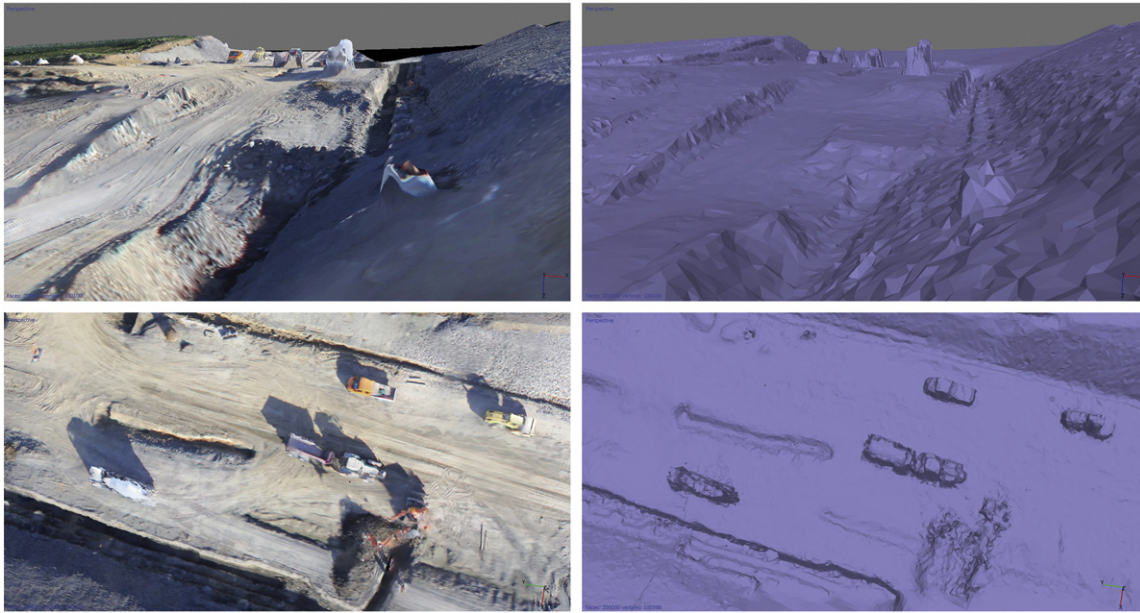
Next steps in research: automated analysis of excavation parameters (slope and safety requirements) and construction equipment and earthwork progress tracking.
